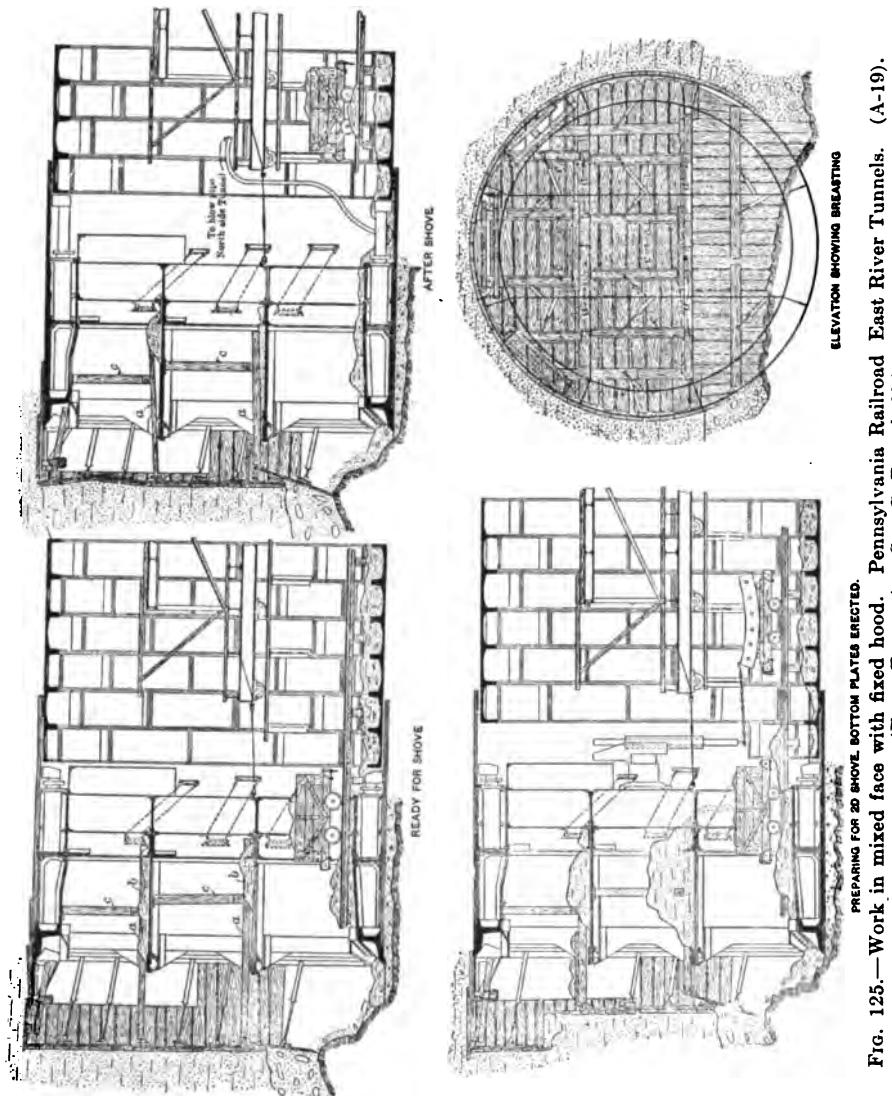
Work in mixed face with fixed hood. Pennsylvania Railroad East River Tunnels. (A-19).
